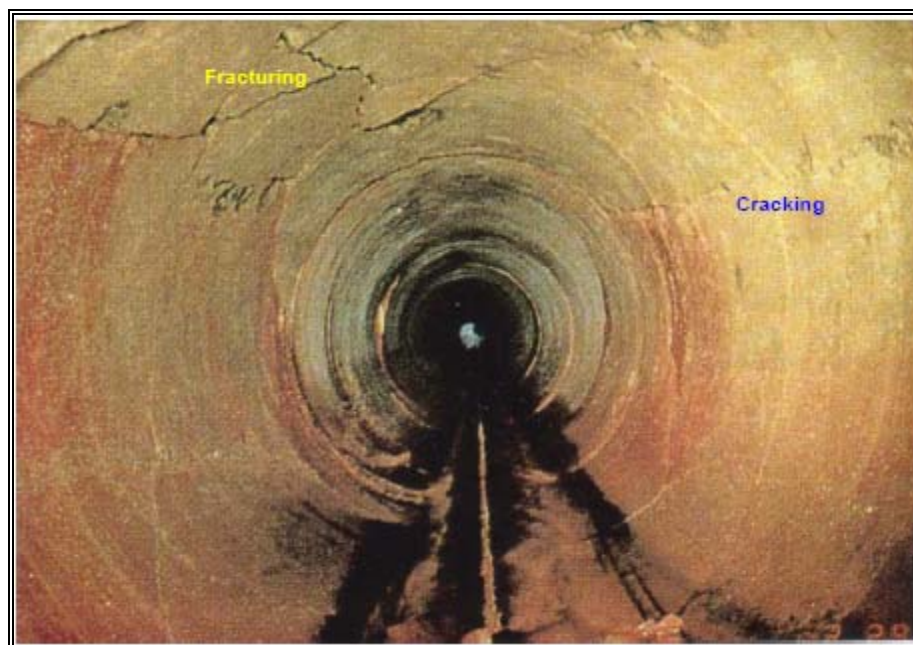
Example of sewer pipe cracking in a concrete main (WSAA 2005)
